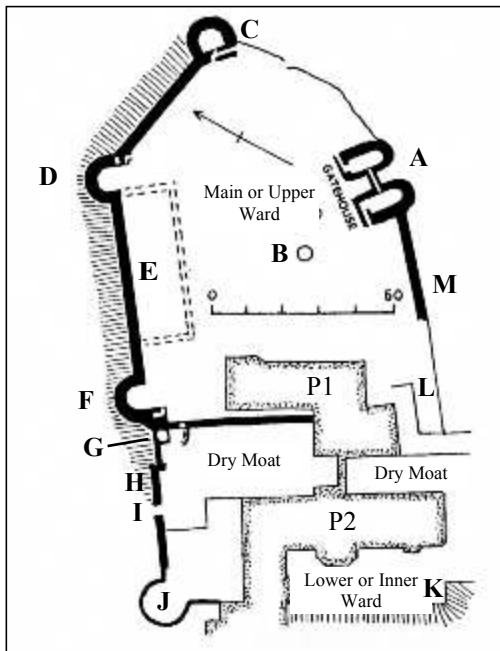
Ruthin Castle plan. Ground plan (after Mike Salter). Labelling by the Journal editor.
